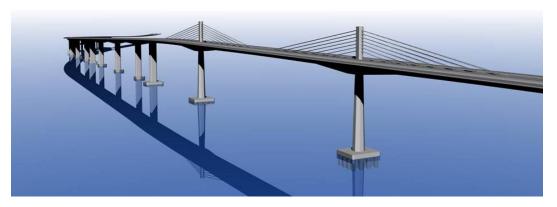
Initial Structural Concept for the Extradosed Bridge
